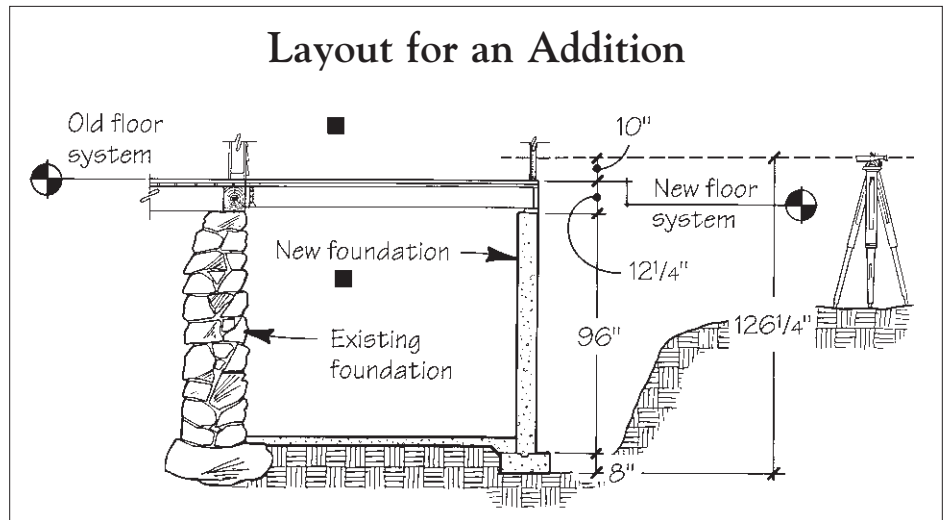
Matching existing floor heights requires careful layout and an accurate foundation hole. Add the benchmark height (10 inches in this example), the thickness of the new floor system and sill plate, the height of the foundation wall, and the thickness of the footing to determine the excavation depth.
